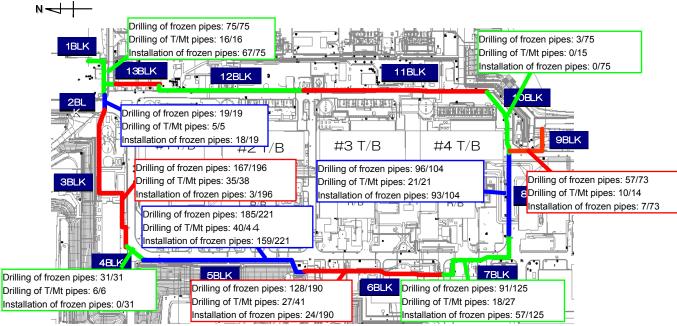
Drilling status for frozen-soil impermeable walls and installation of frozen pipes
